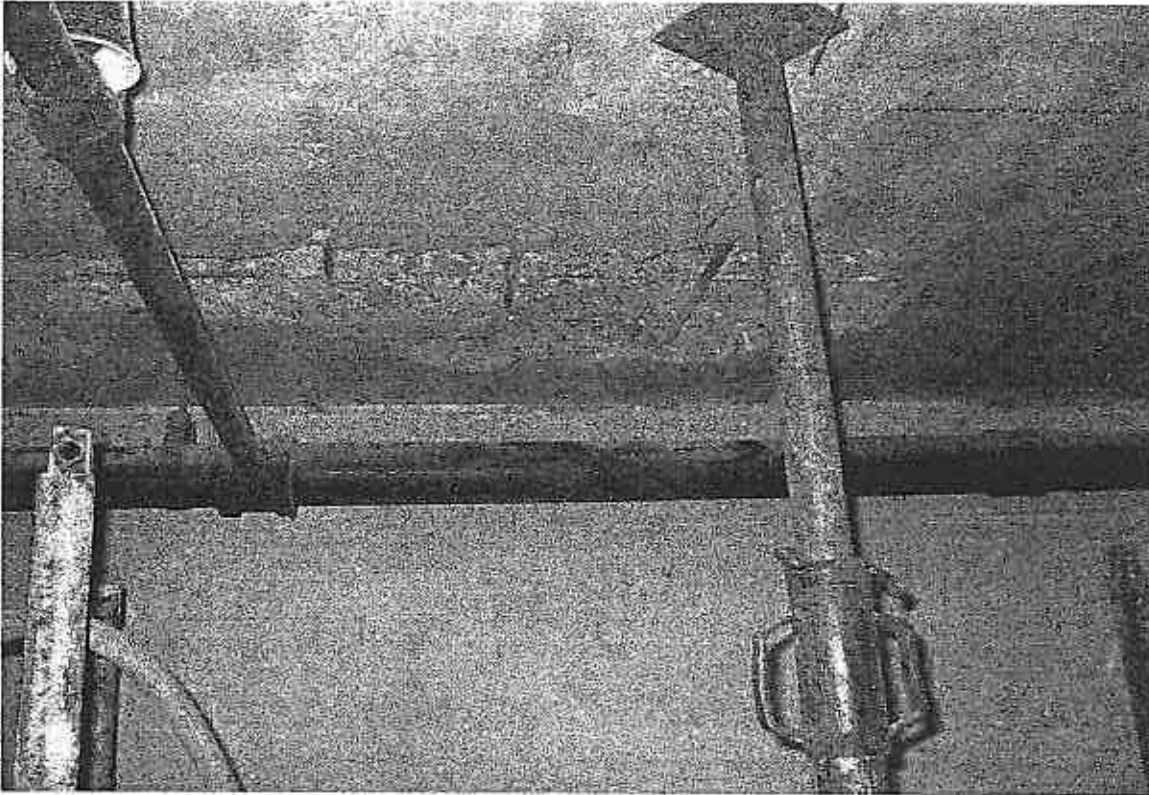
& 10 – Show typical areas being chipped of the existing delaminated concrete and preparation for repair.
